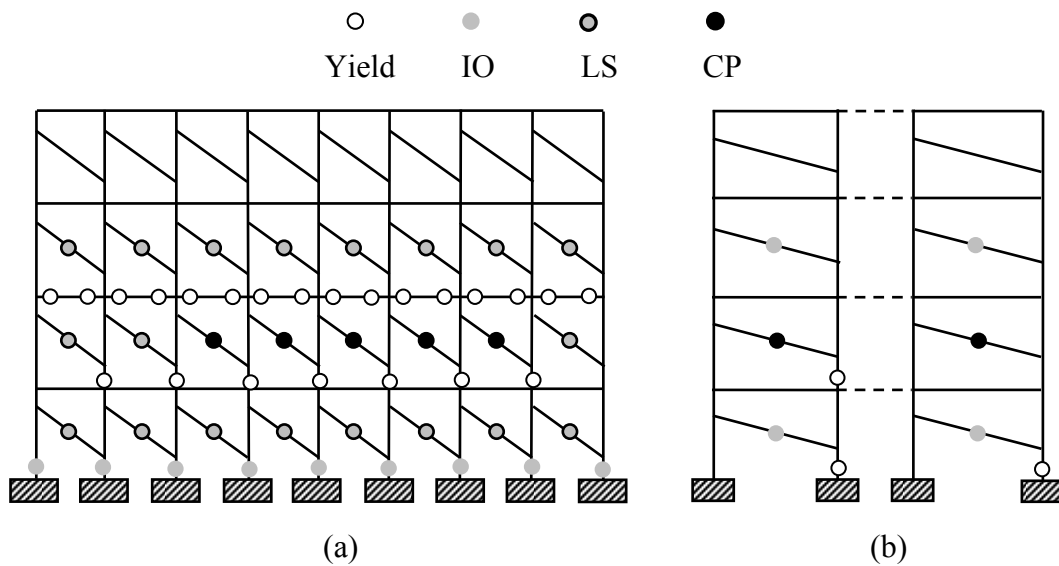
Collapse mechanism of four storey RC frame building with URM infills, designed as SMRF as per relevant Indian Standards: (a) typical longitudinal frame; (b) typical transverse frame.
